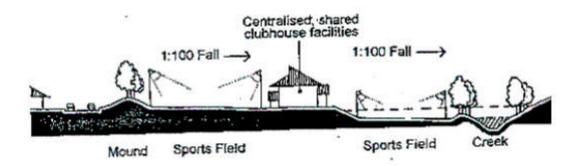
represents a typical single multi-use sporting area suitable for a small town or village. Larger multi-use sporting areas are to be provided in the cities and towns (refer Figures 8 - 9).
